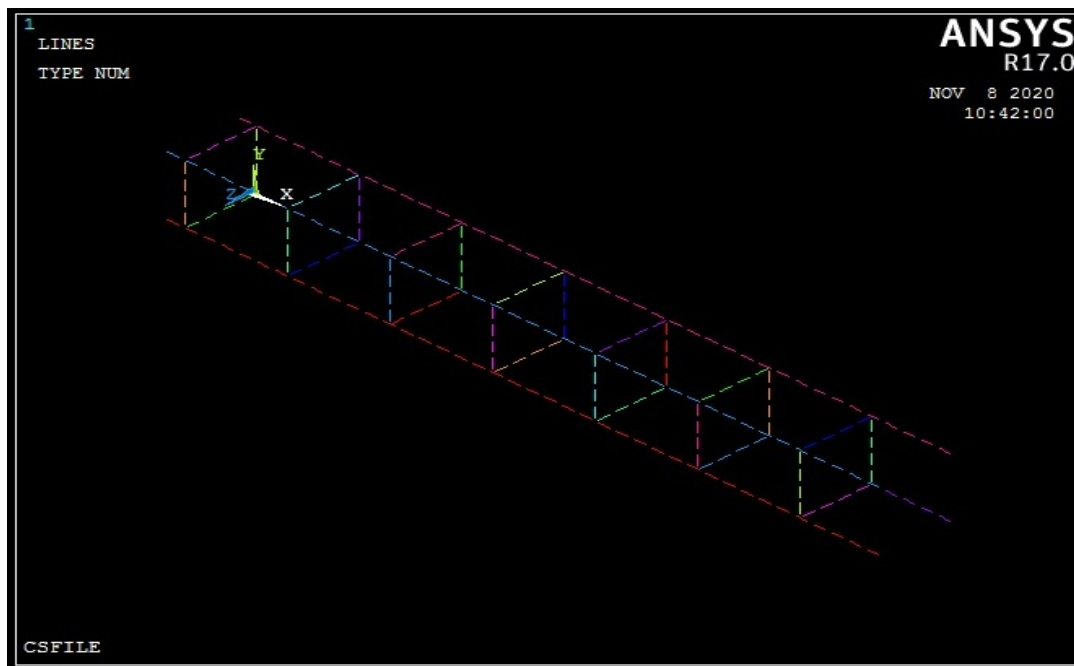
Longitudinal reinforcement and stirrups in FE model
